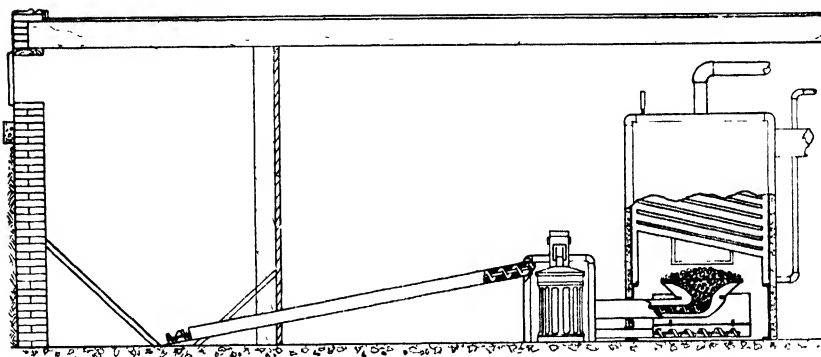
UNDERFEED SCREW STOKER WITH AUTOMATIC ASH REMOVAL
